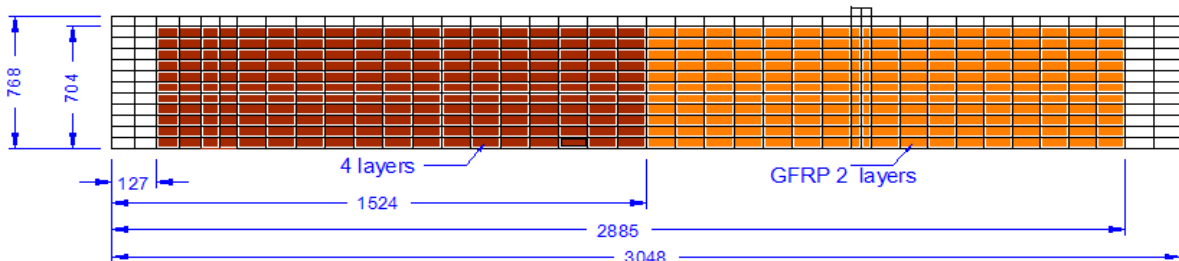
Modified dimensions of FRP reinforcing for strengthened shear beam.
